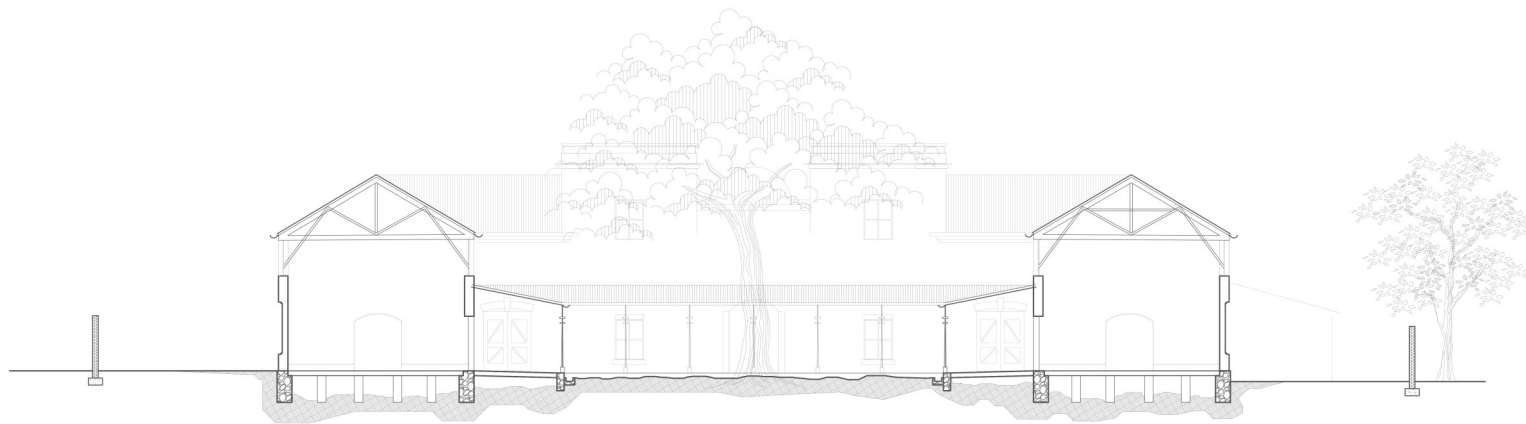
Proposed Elevation of the Staatsmuseum North Wing Design (Author 2020)
